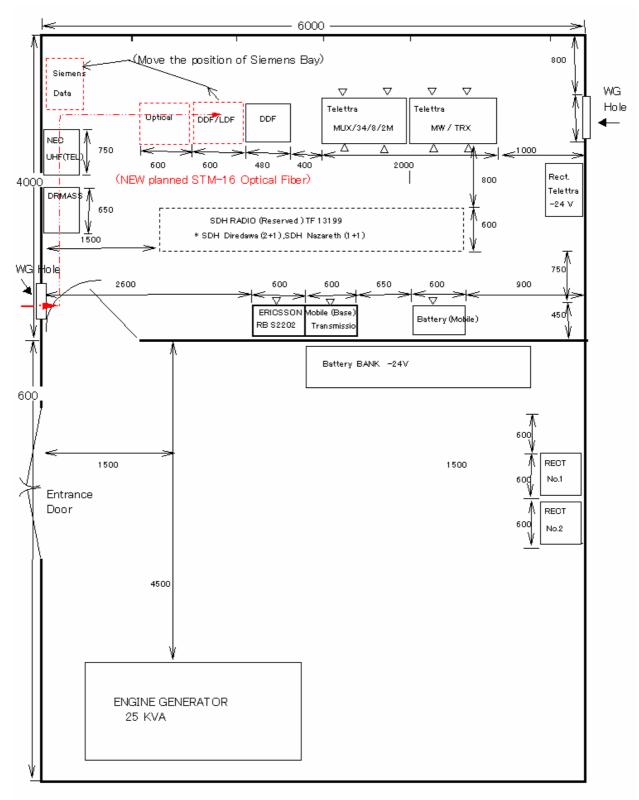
RADIO/MUX ROOM Planned Installation Place
